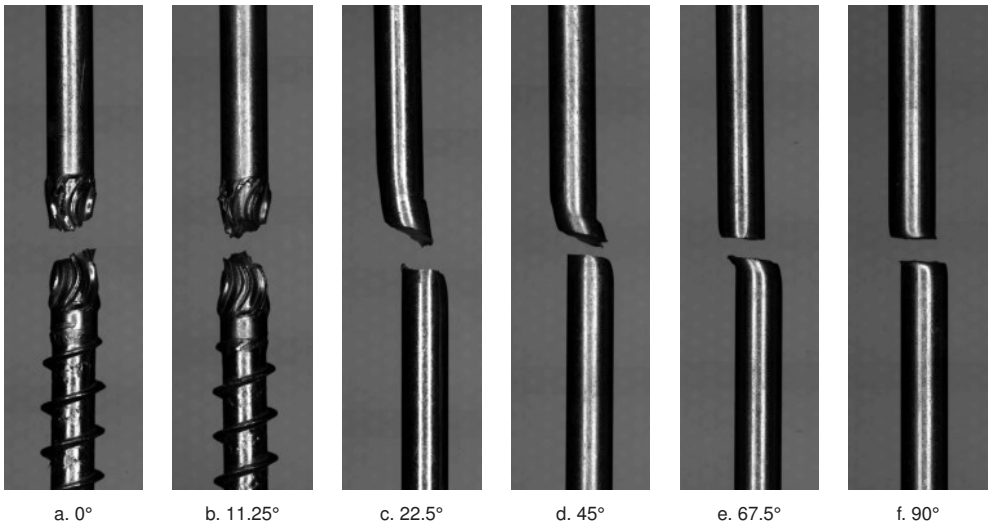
Fracture surfaces for partially threaded screws $d = 8$ mm.
